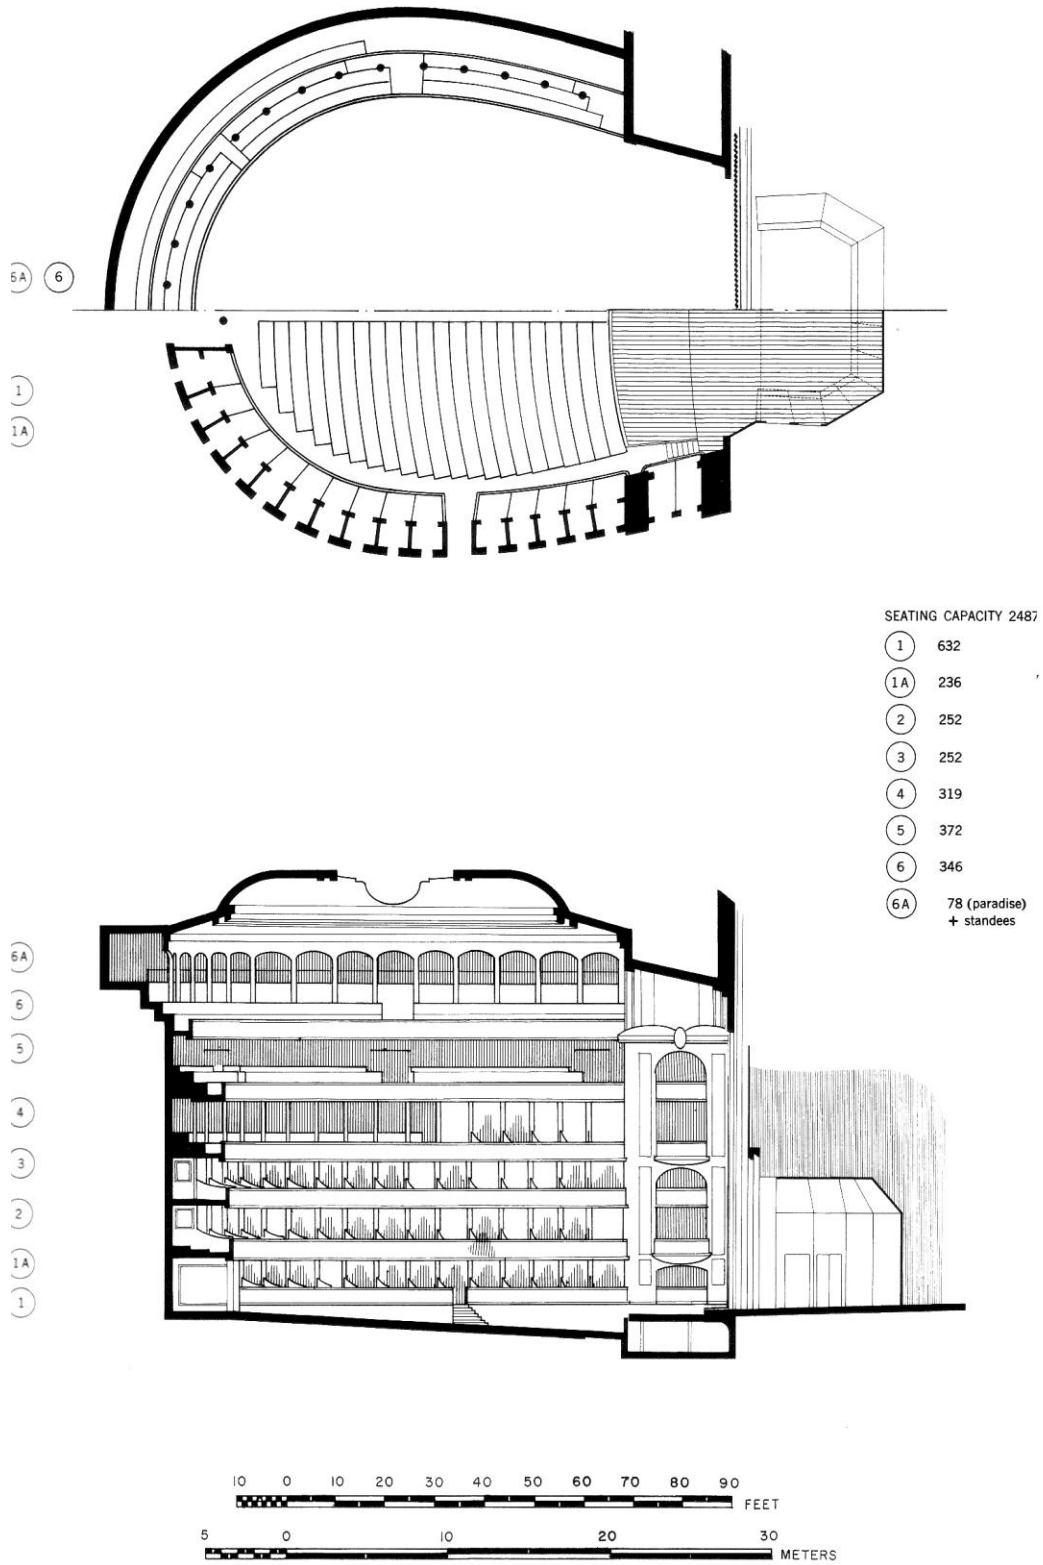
Teatro Colon, Buenos Aires, Argentina, plan and section
